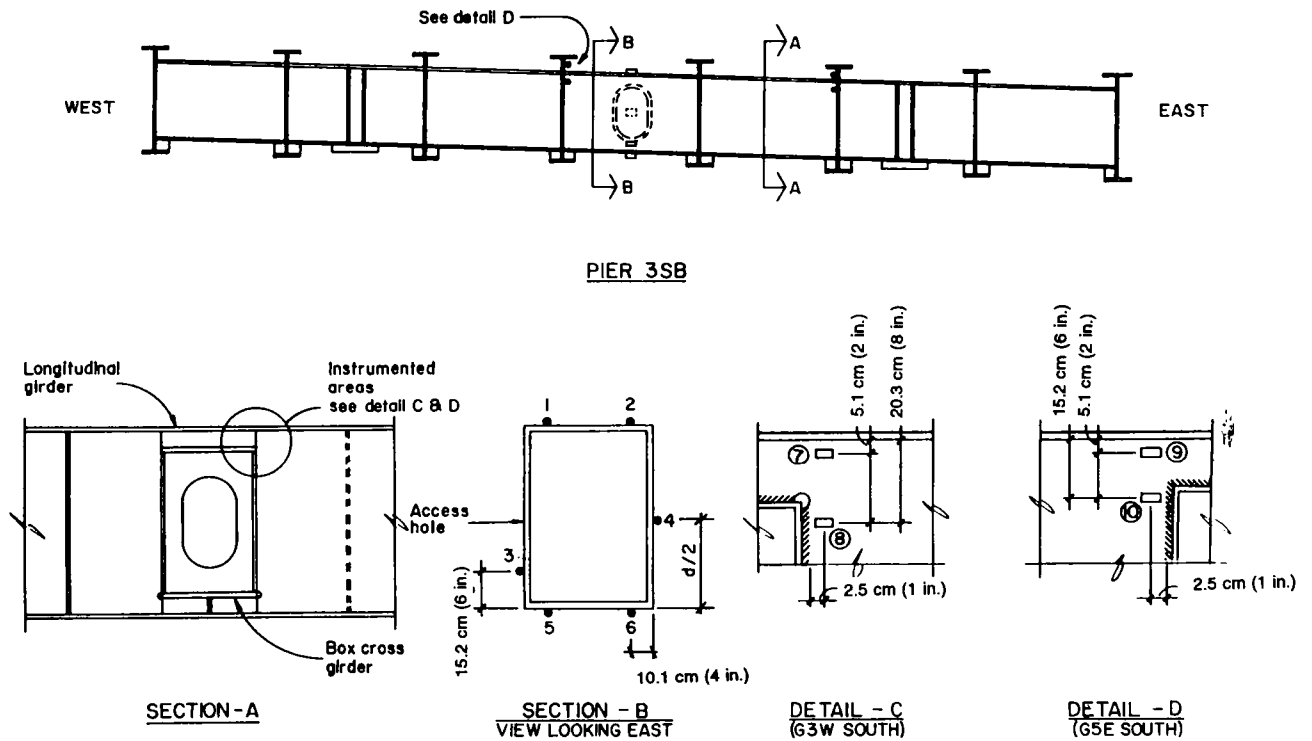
Strain gauge layout on cross-girder at southbound Pier 3.
